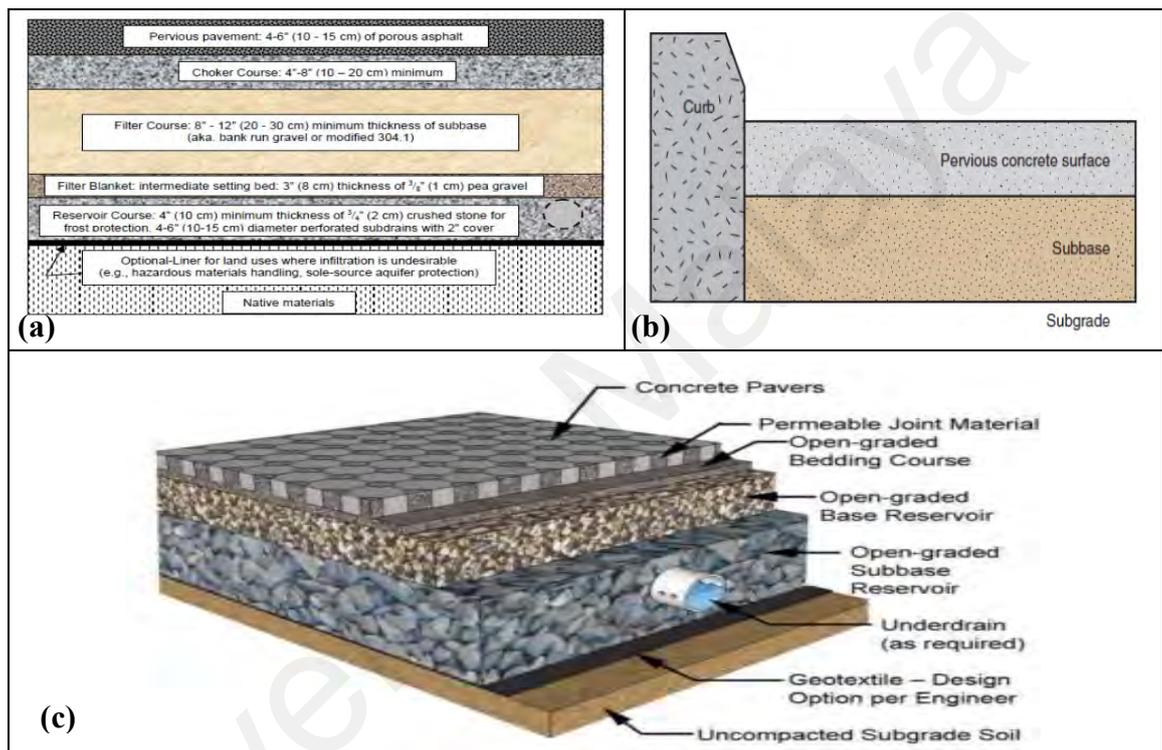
Typical cross-section of permeable pavement system (a) porous asphalt pavement (NAPA, 2008), (b) pervious concrete pavement (Source: ACPA, 2009) and (c) permeable interlocking concrete paver system (Source: ICPI, 2013)
